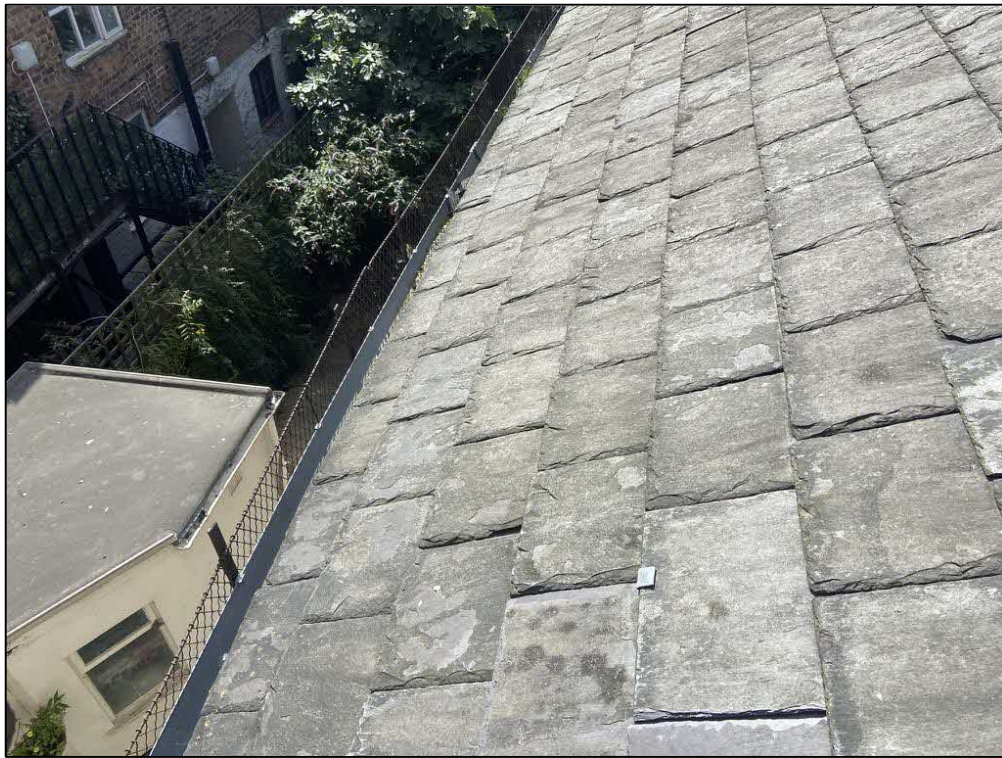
The fascia of this roof section features some netting, presumably anti-bird netting.
